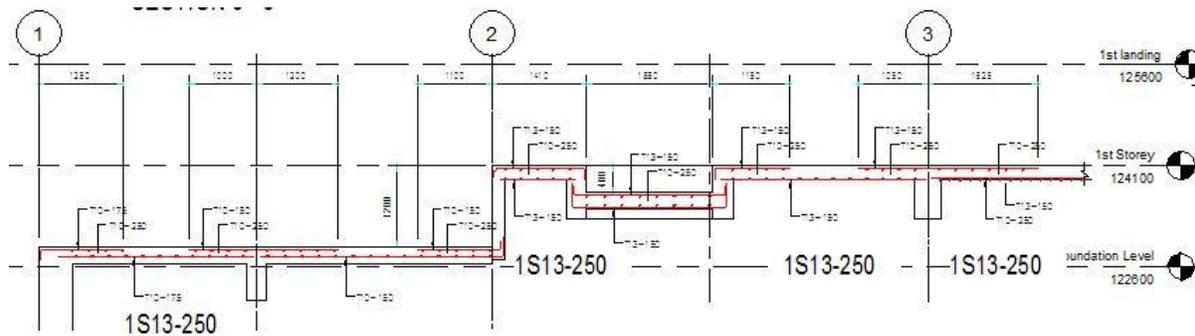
Structural Slab Detail (Image courtesy of JTC)
